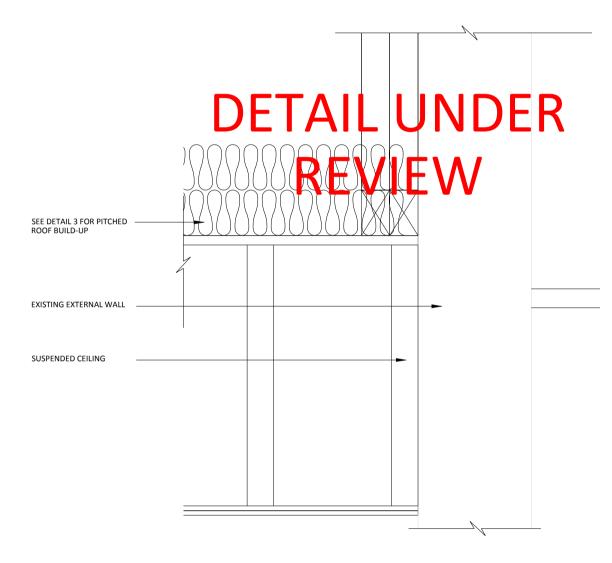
PITCHED ROOF AND EXTERNAL WALL JUNCTION DETAIL
